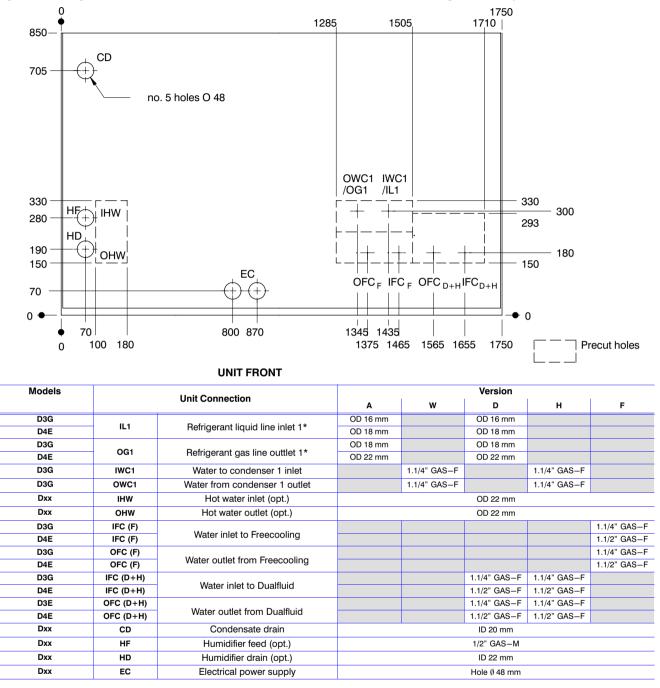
n Refrigerant, water and electrical connections Liebert HPM D3G-D4E, singlecircuit - plan view
